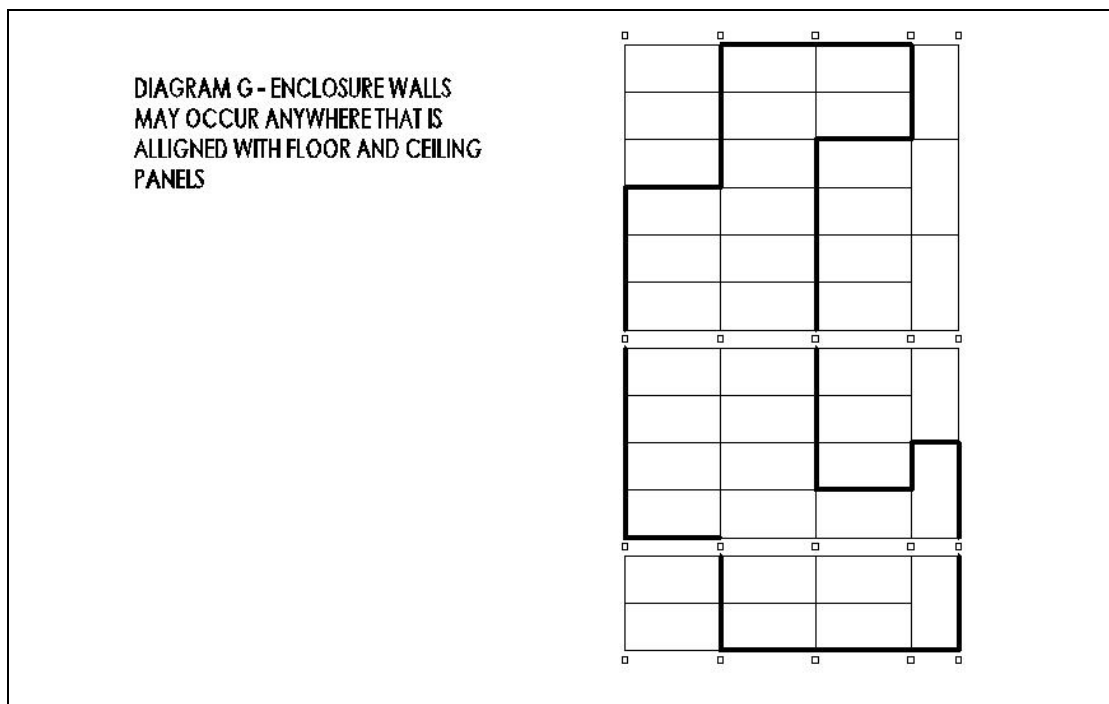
Relationship of Enclosure Walls to Structural Frame
